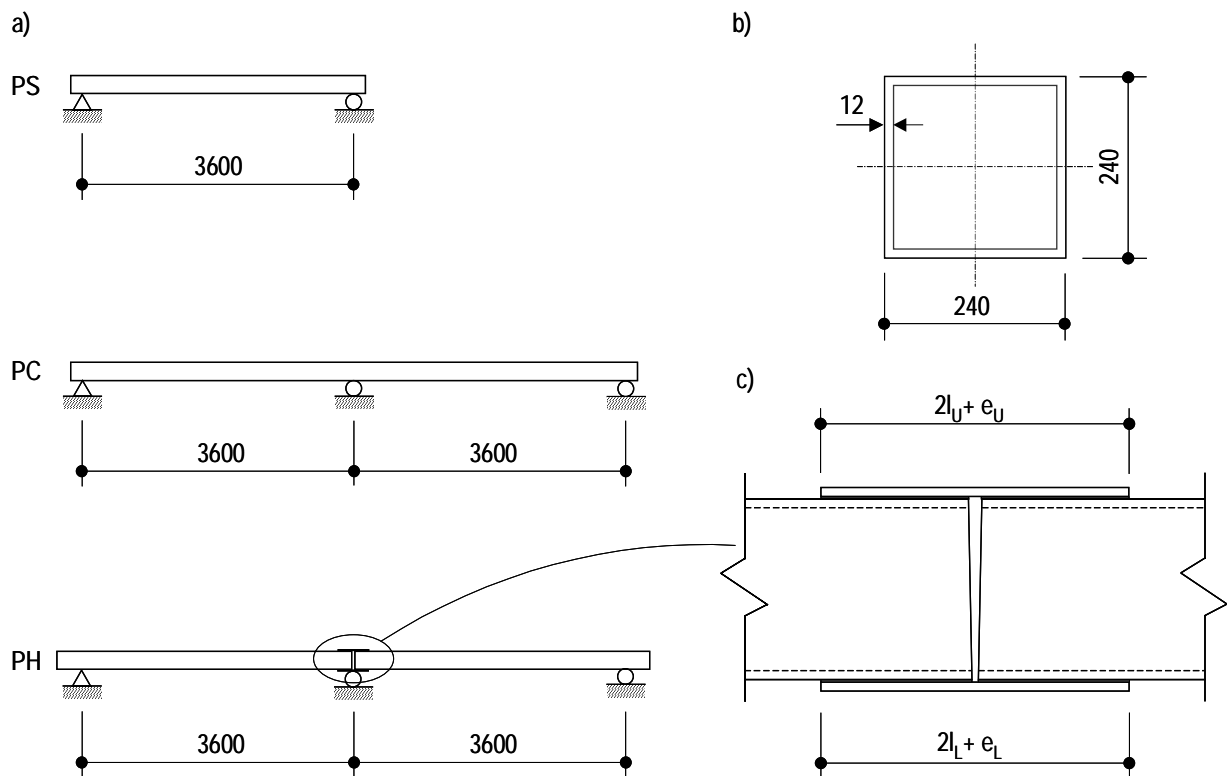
(a) Beam series; (b) Idealised beam section; (c) Joint detail
